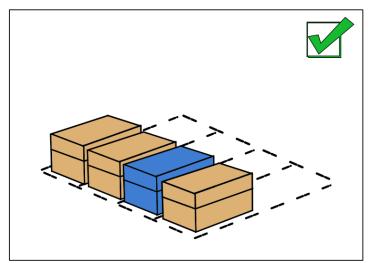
Setback of the new infill building (blue) matches the setback of the contributing resources from the primary street-facing elevation from the sidewalk
